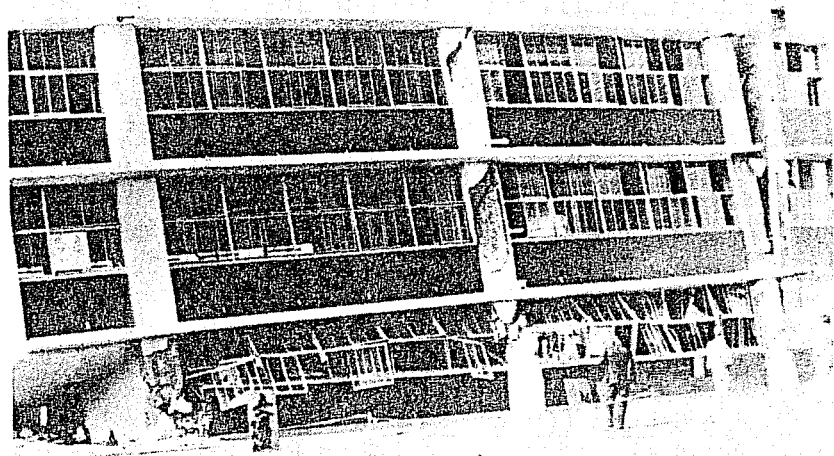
Column Failure in Japanese Building - 1968 Tokachi-Oki Earthquake [4]
